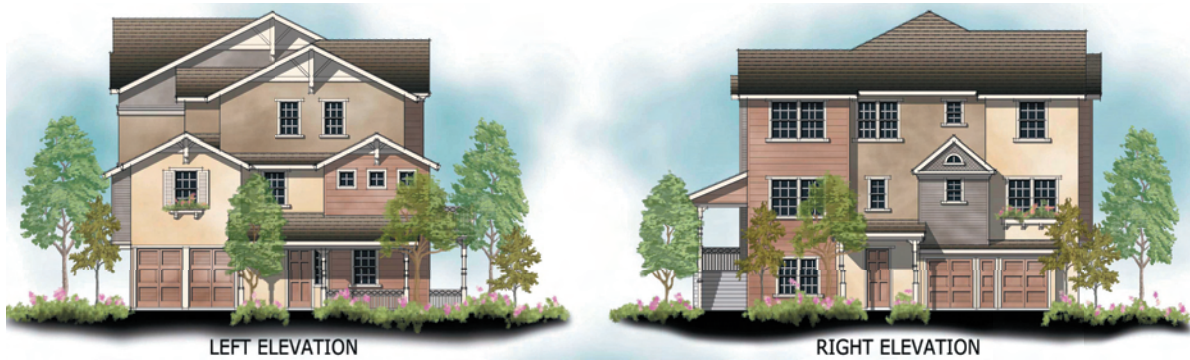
D.57: Sample Residential Building Side Elevation (Northern Neighborhood)
